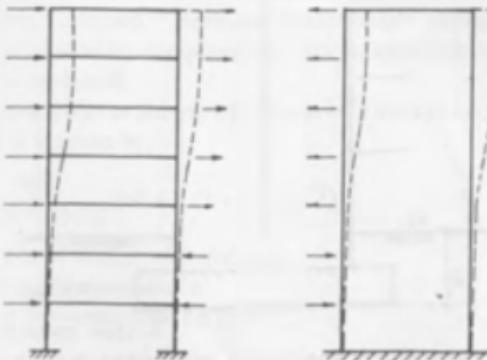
Behaviour of shear walls and frames under horizontal loads.
